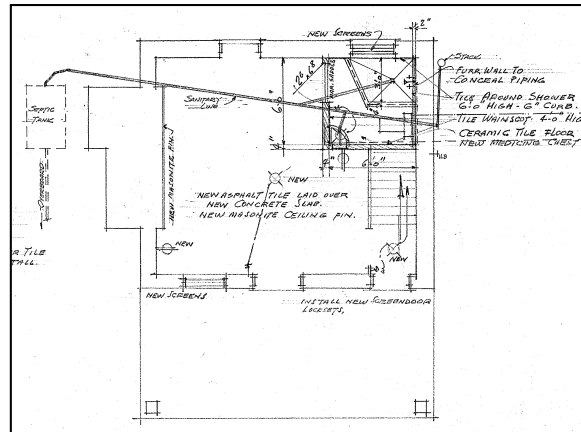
Close-up of first floor plan showing work on the building in 1951.
